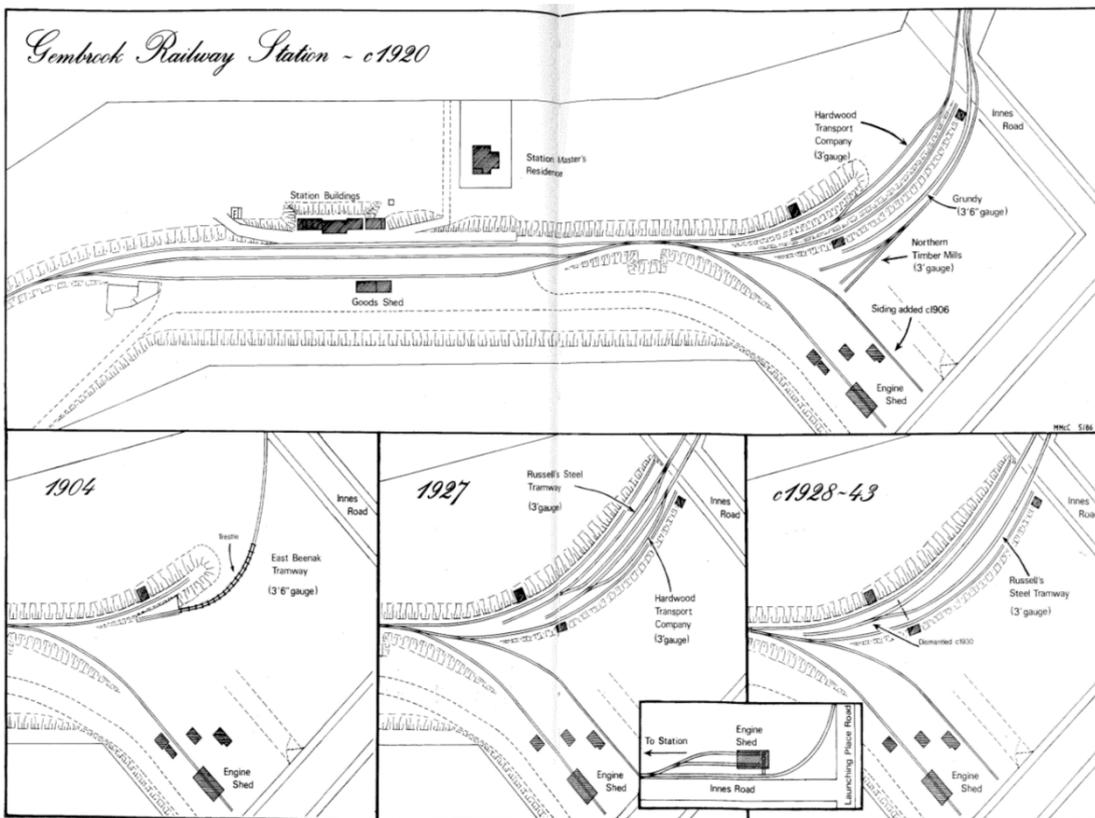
Plans of Gembrook Station ground 1904-1943 showing changes (McCarthy, 1987, pp. 32-33)
